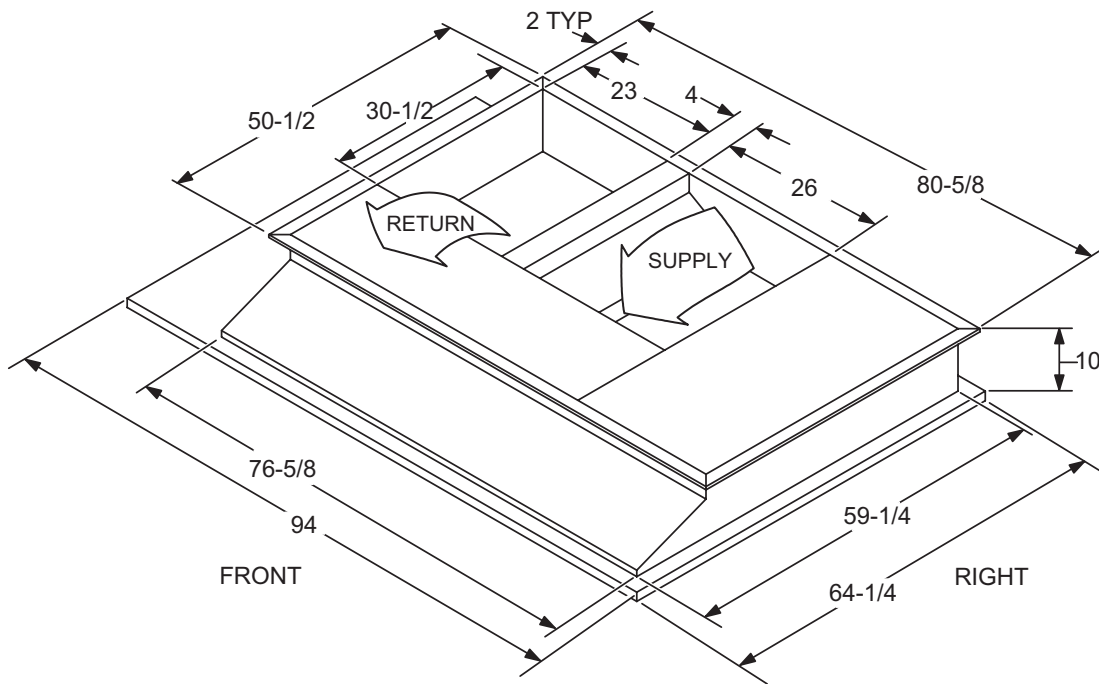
SUNLINE™ TO PREDATOR® TRANSITION ROOF CURBS
